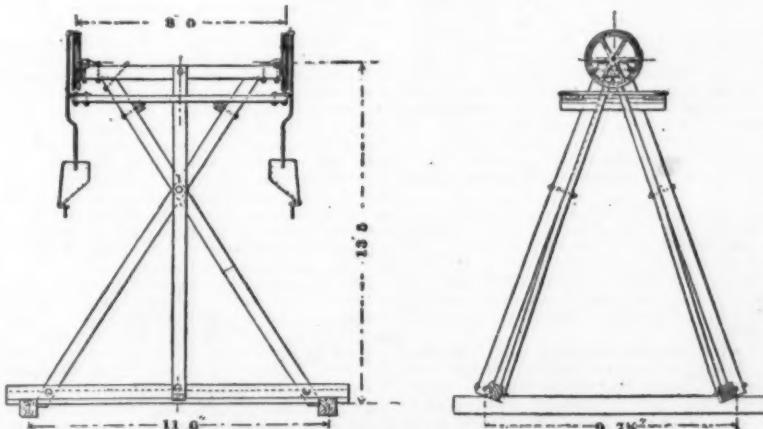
WIRE ROPEWAY—PLAN OF TRUSSED SUPPORTING STRUCTURES
